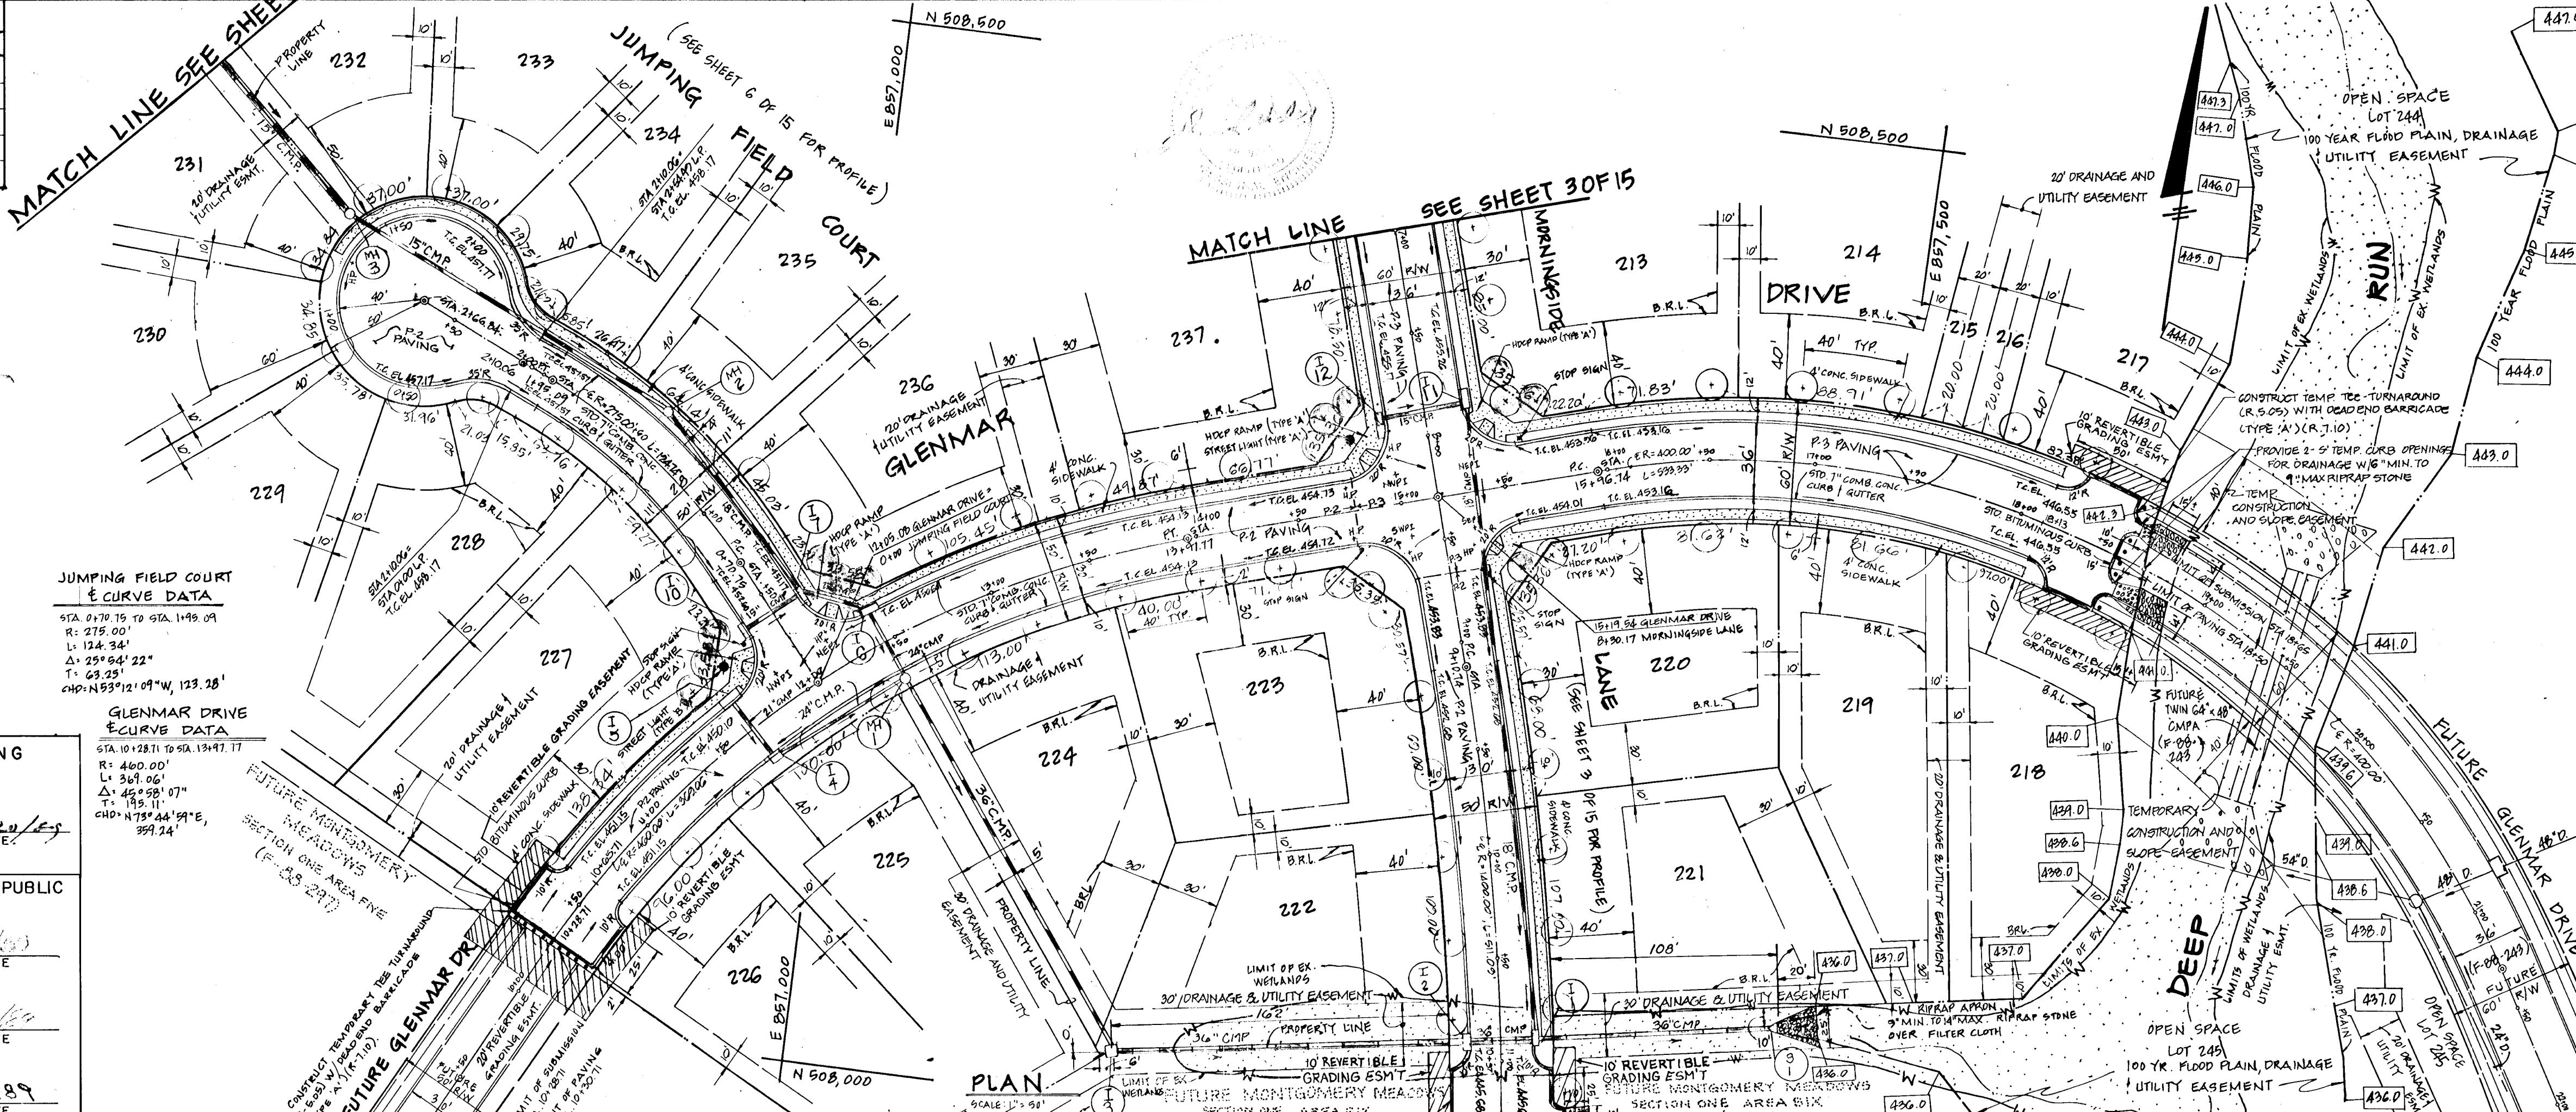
SINGLE PLAN AND PROFILE-FULL LINE
